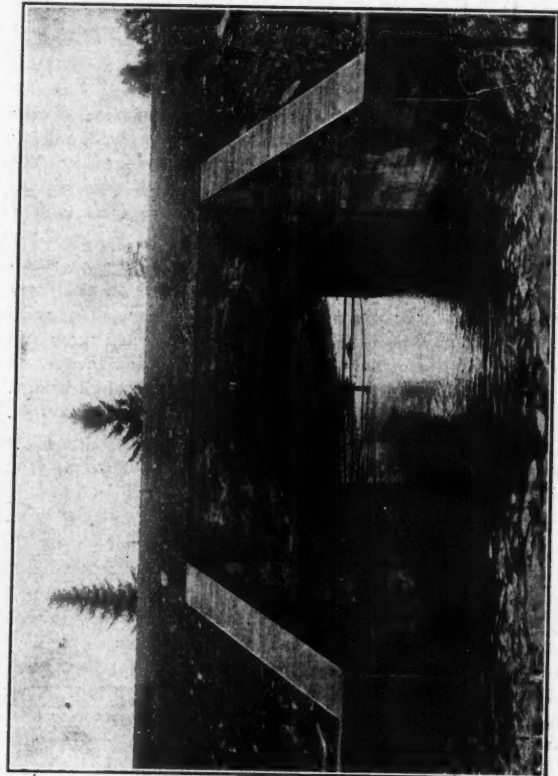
Eighteen-Foot Culvert, Bangor & Aroostook R. R.
